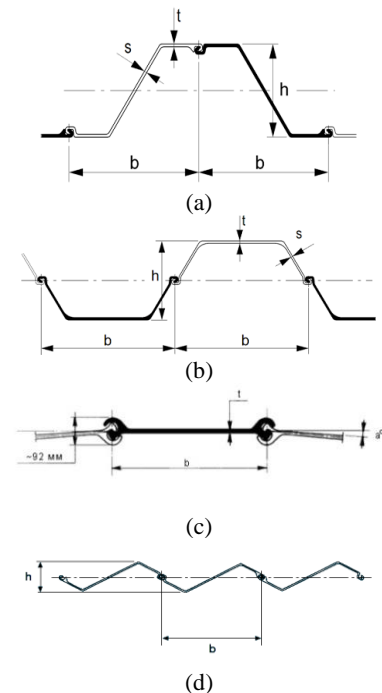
Types of sheet piling (a – Z-type sheet pile; b – U-type sheet pile; c – flat sheet pile; d- jagged wall of Z-type sheet piles)
